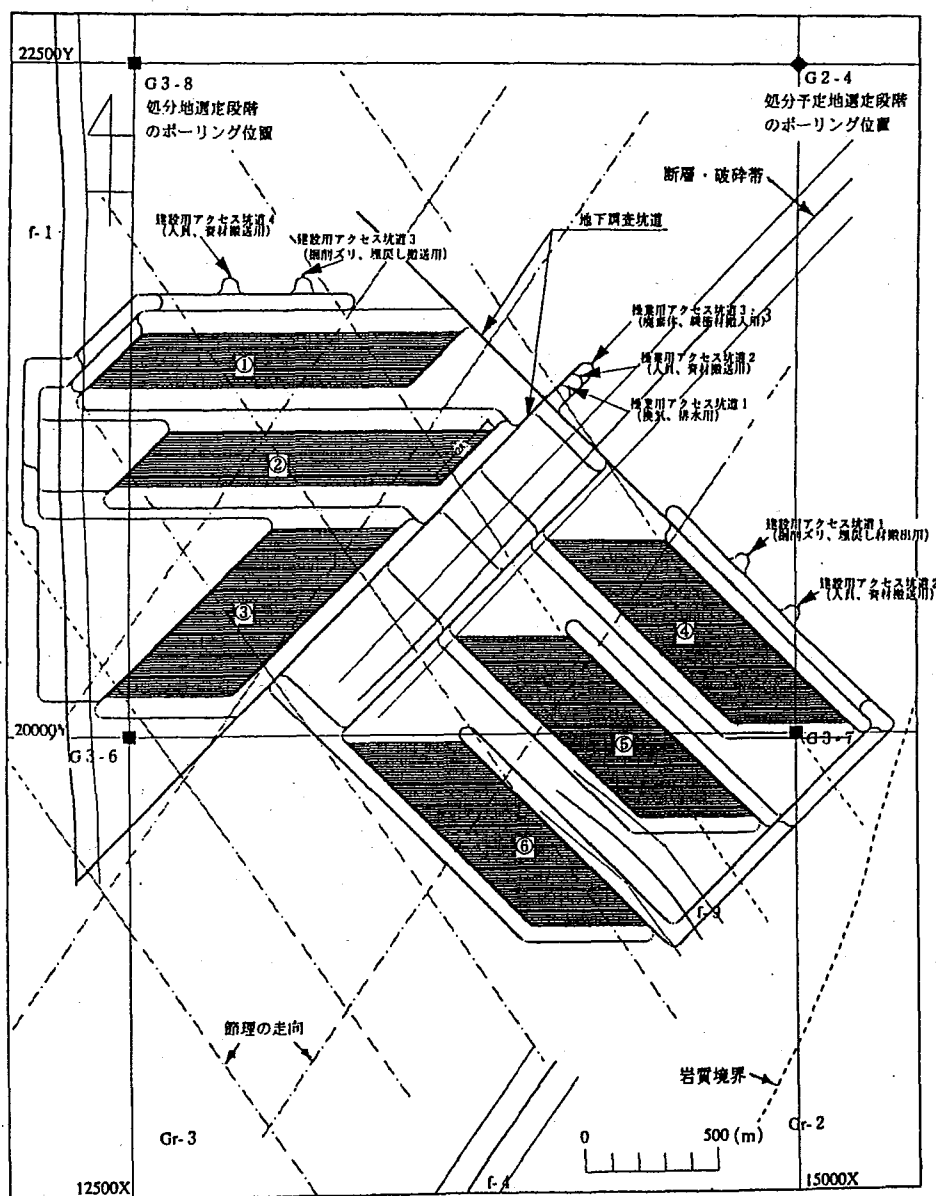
Detailed plan of facility layout in area of granite rock Formation (vertical emplacement method)
